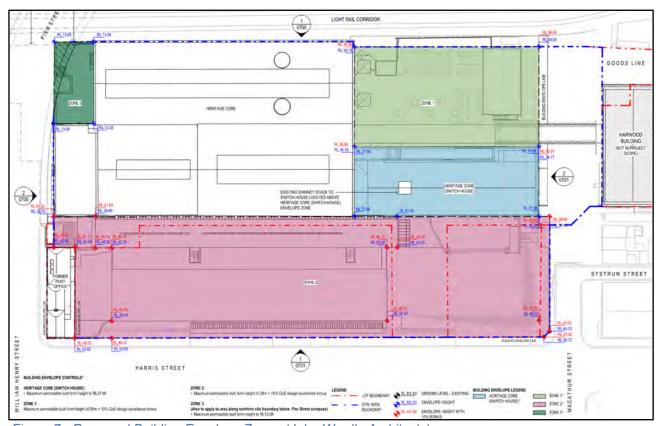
Proposed Building Envelope Zones (John Wardle Architects)
